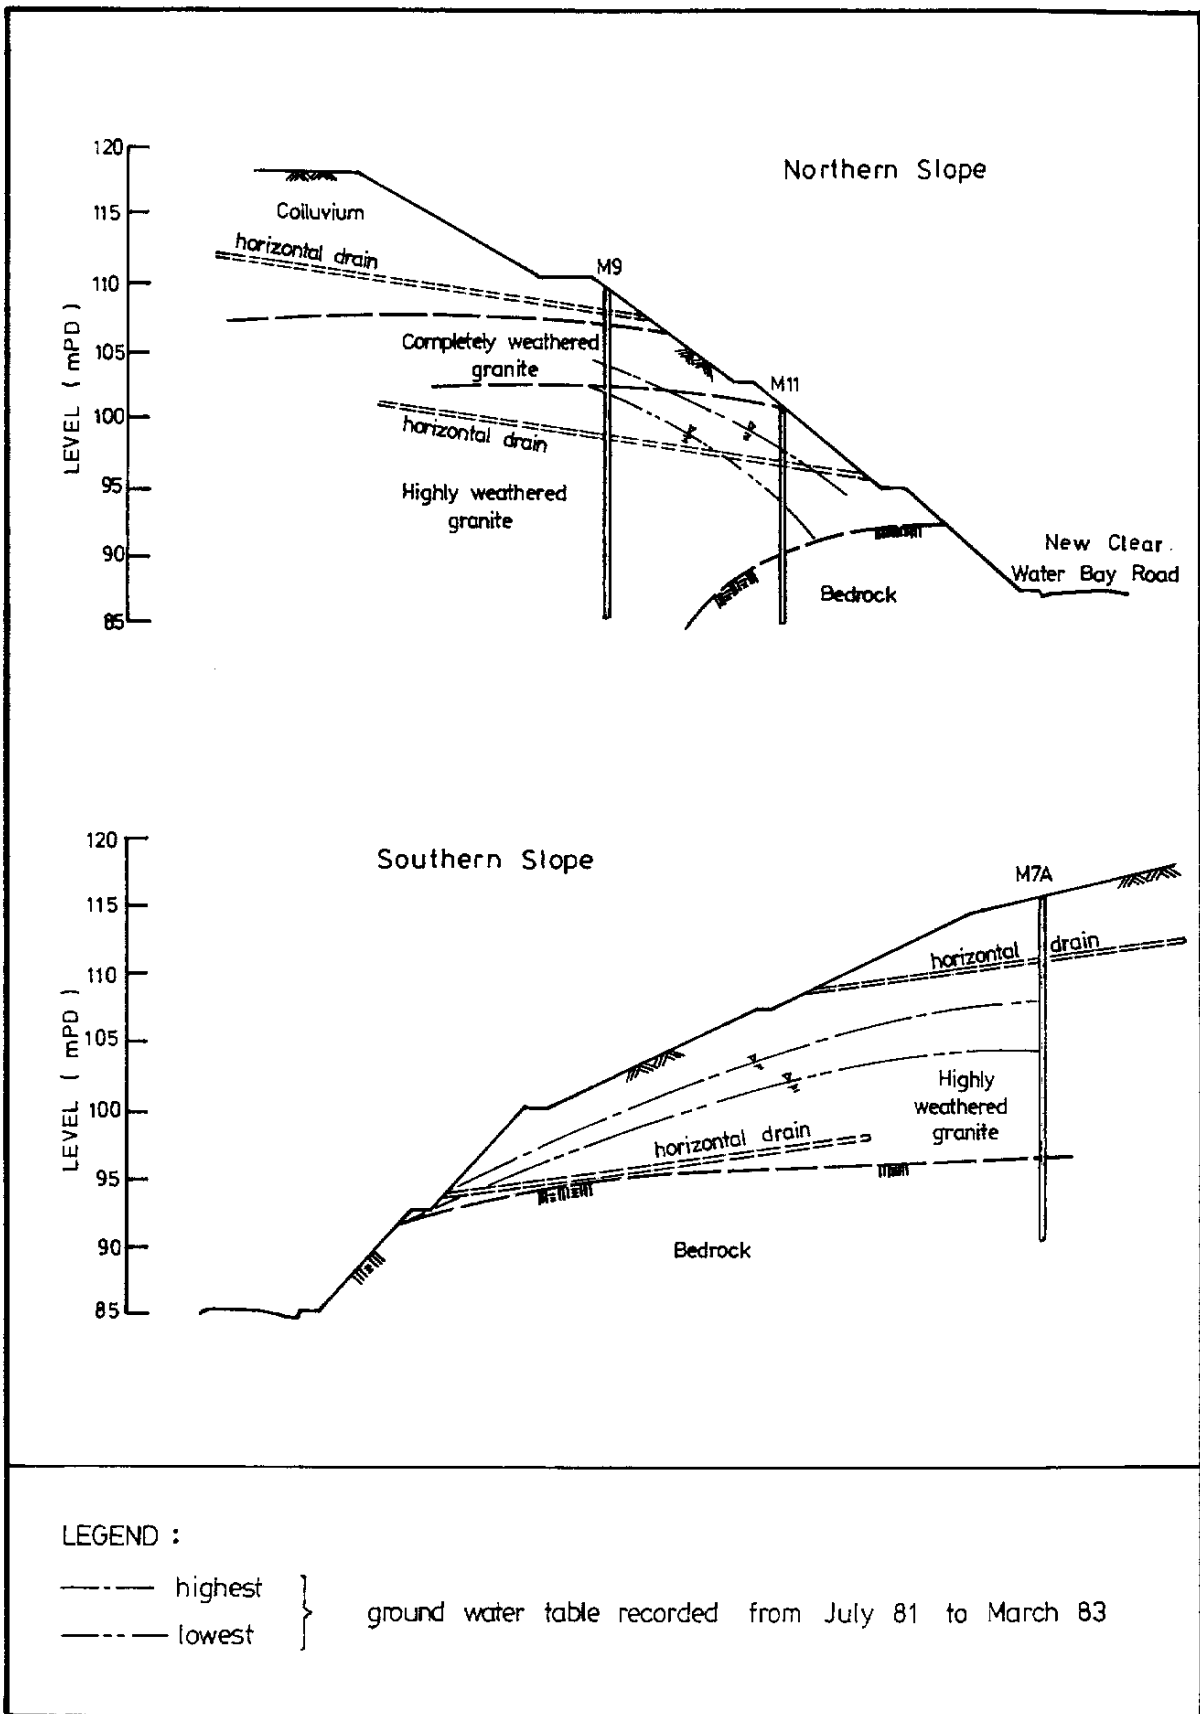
Typical Sections Showing Ground Conditions and Positions of Horizontal Drains at New Clear Water Bay Road (after MAA,1983)
